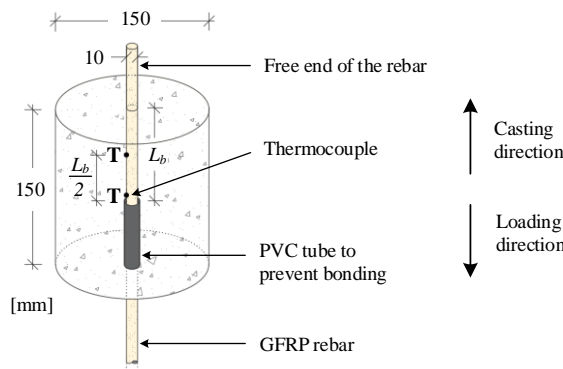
Pull-out test specimen geometry and thermocouples placement.
